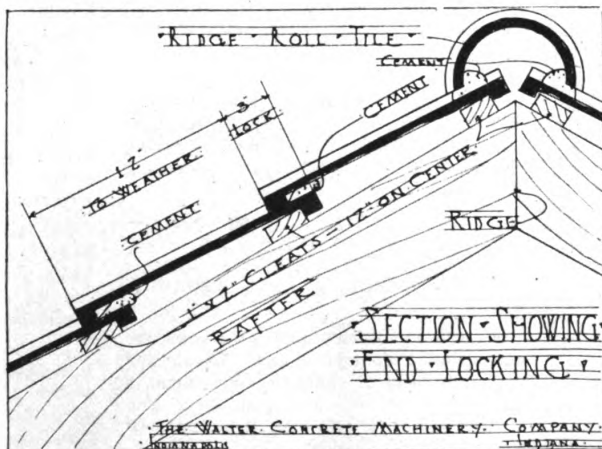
Section Showing How Walter Concrete Tile is Placed on a Roof
